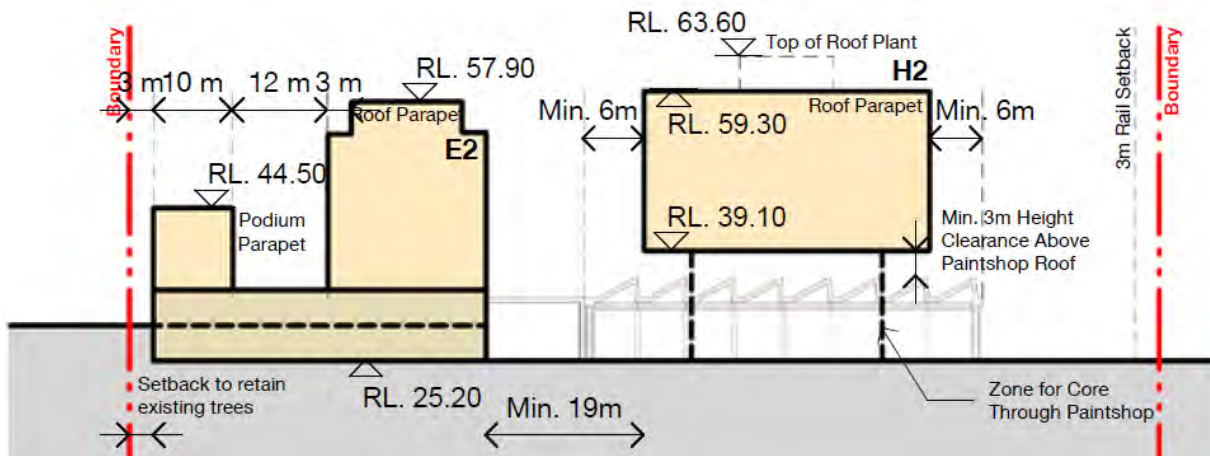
Building envelopes section showing north-south cross section through proposed Paint Shop overdevelopment, showing structure to be supported above the existing sawtooth roof of the Paint Shop, to minimise physical impact required to the roof and structure of the building (Source: Bates Smart 2022, Figure 9.5.6.4)
